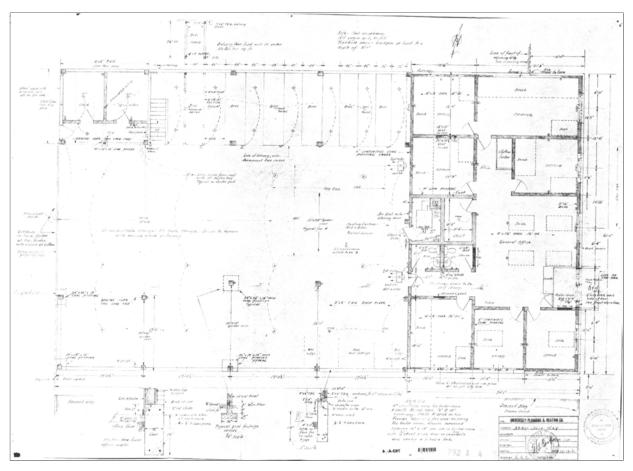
Interior floor plan for 3941 University Way NE, 1942, courtesy of the University of Washington Facilities Library.
